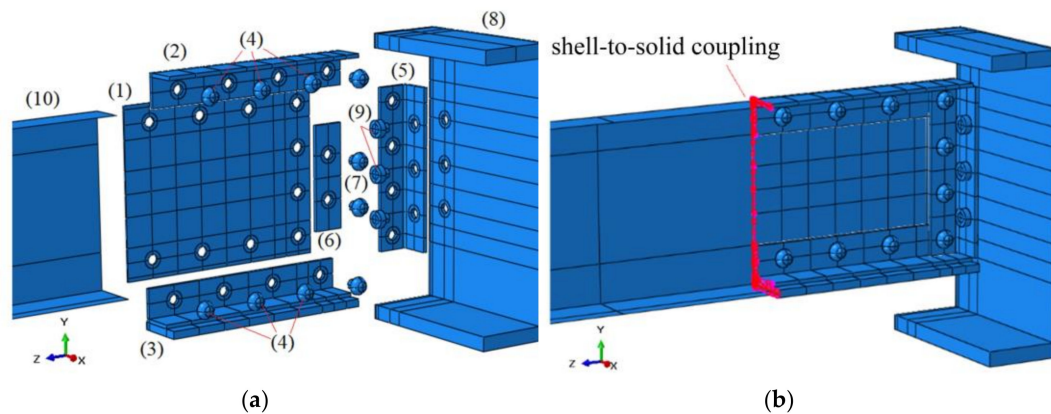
Assembly of the stringer-floor beam connection Finite Element (FE) local model. (a) Exploded view of model parts. (b) Shell-to-solid coupling.
